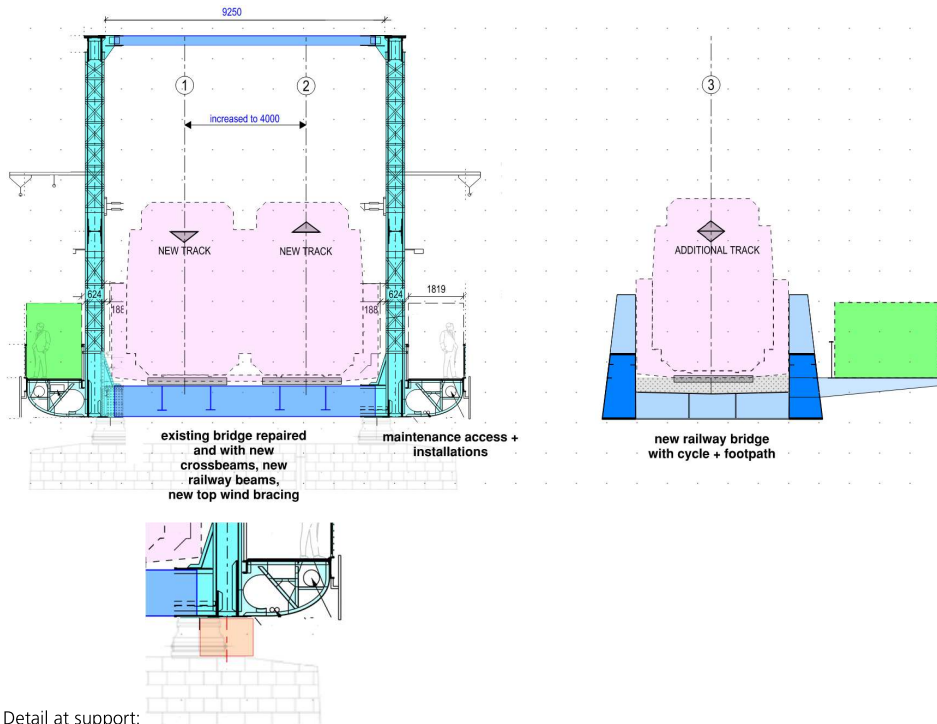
Option 2 + 1c. Cross-section and detail at support.
